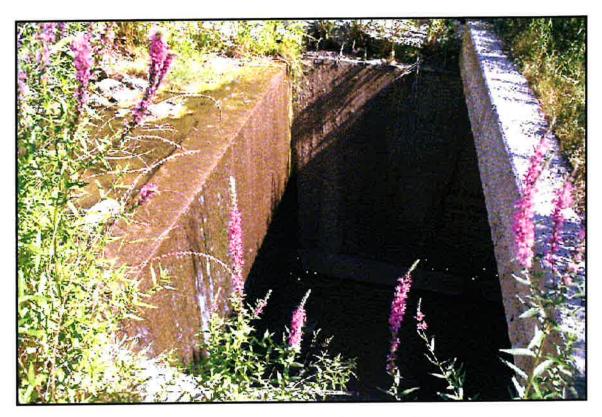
Looking down into the cut-off wall structure at the upstream limit of the works
